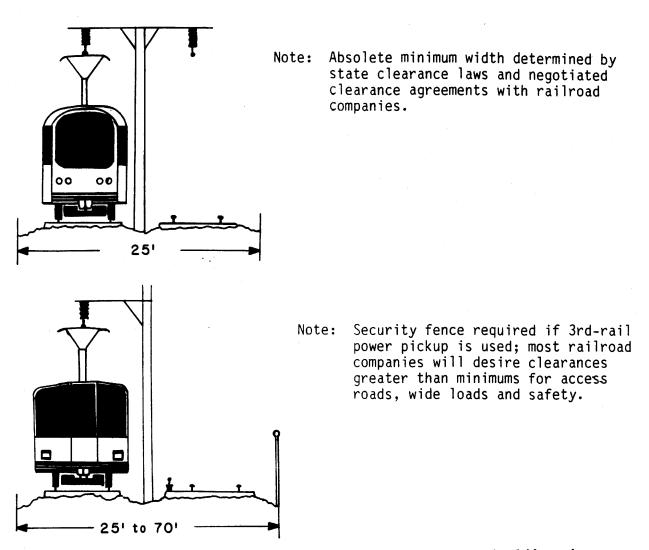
Typical Cross Sections of 2-Way Light Rail Transit Adjacent Railroad Right-of-Way
